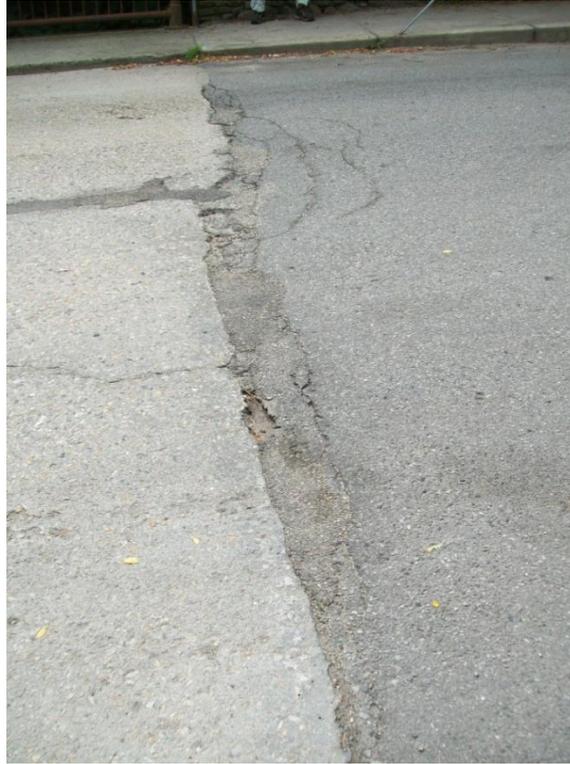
Looking East: Settlement and Cracking at South Bridge Joint
